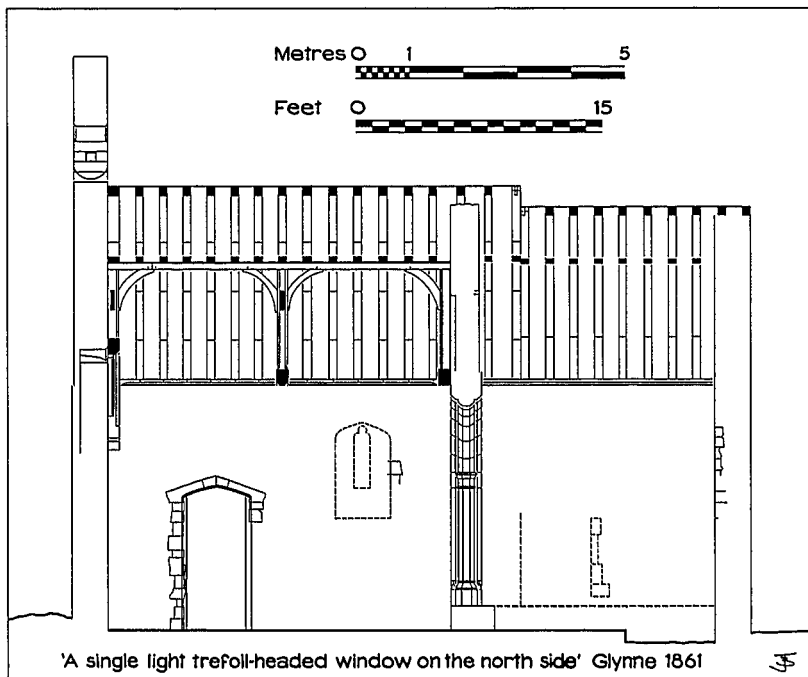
Horton Manor Chapel: Longitudinal Section, looking North (window details hypothetical).
